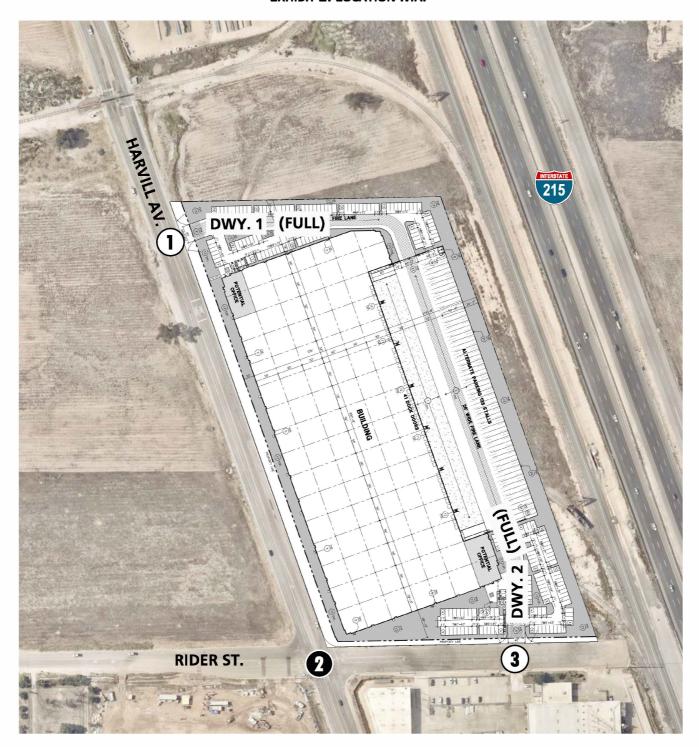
PRELIMINARY SITE PLAN
